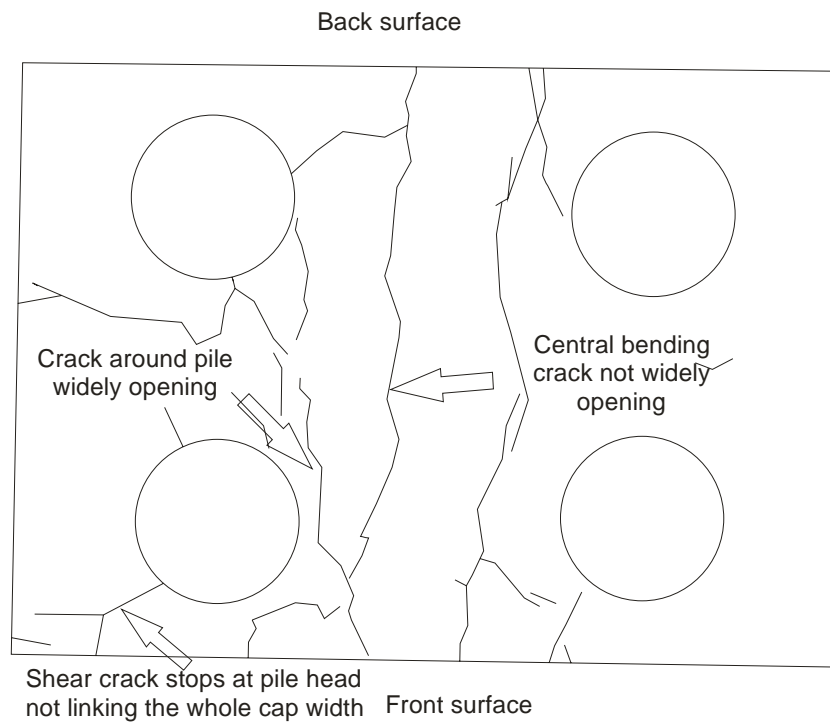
Crack distribution on B4A5 cap soffit at failure step
